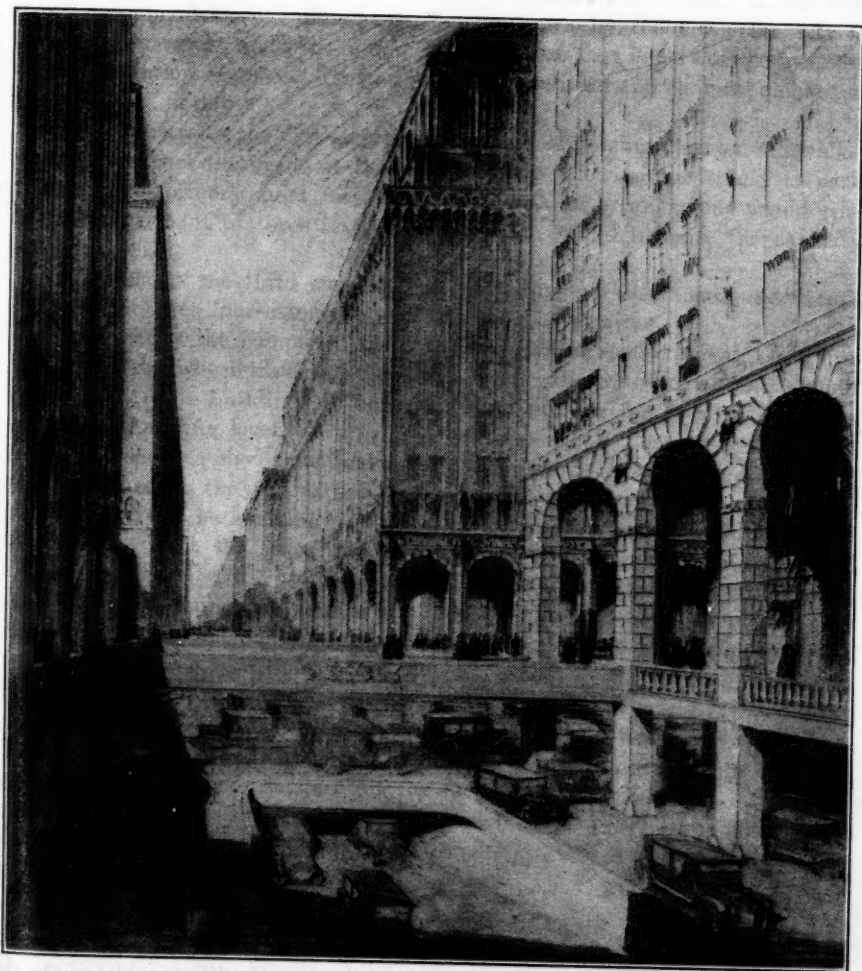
VIEW OF PROPOSED ARCADED CITY STREETS.
